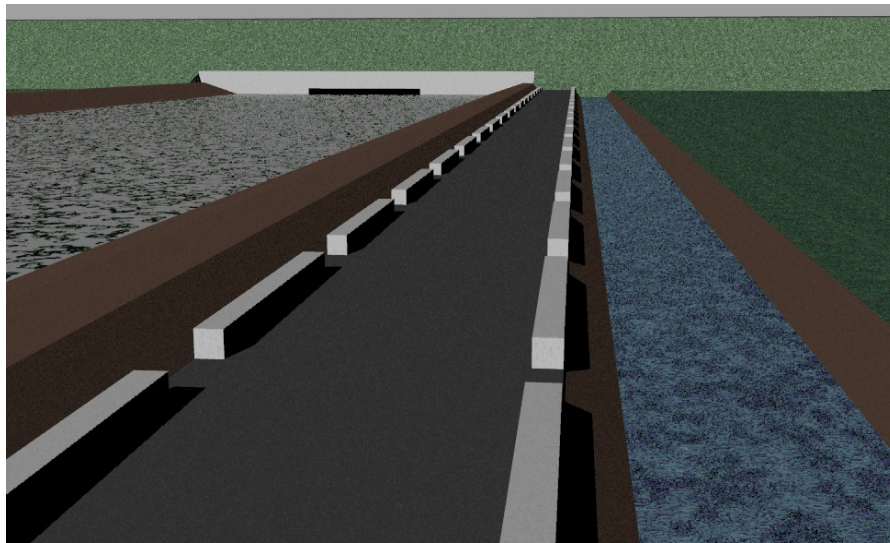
Embankment as overflow structure and the road behind it as stilling basin
